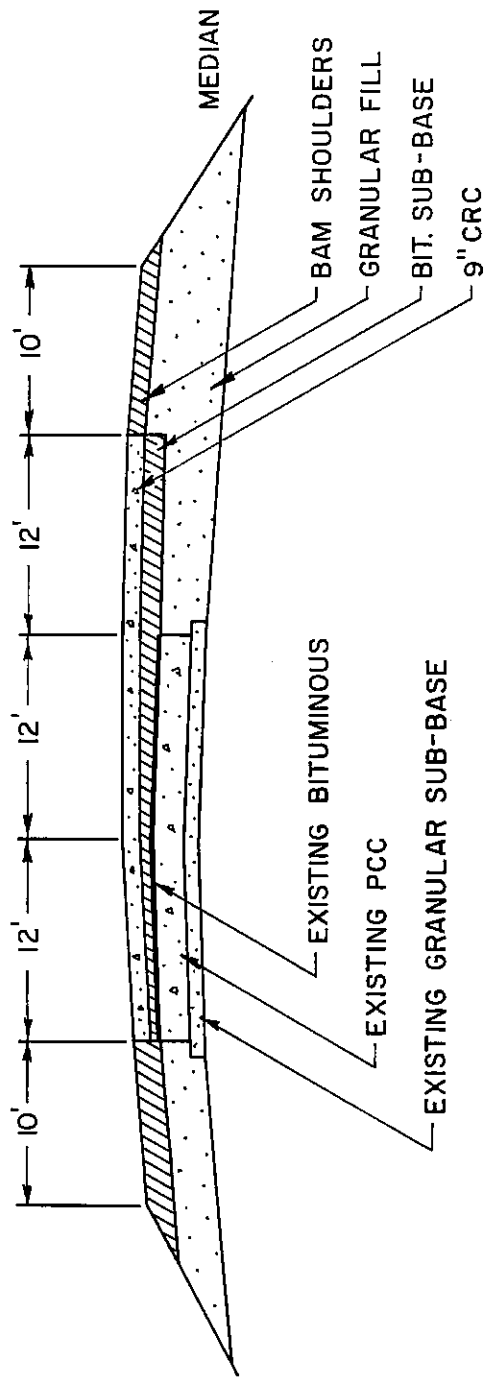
CROSS-SECTION OF PROJECT 2, I-55
